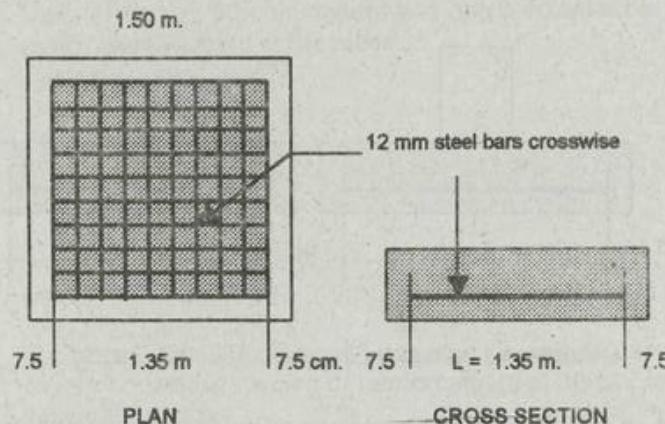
INDEPENDENT FOOTING REINFORCEMENT
